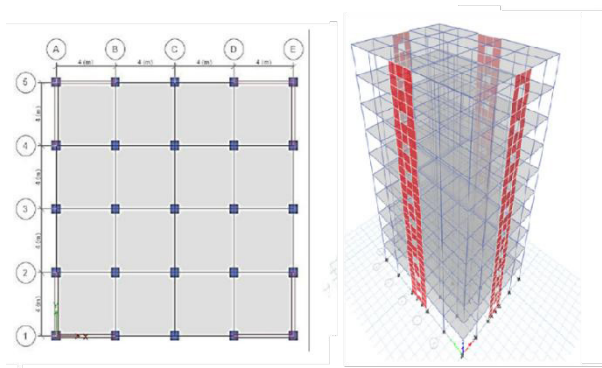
Plan with 3D model of a shear wall construction with a 2 m x 1.75 m staggered aperture
